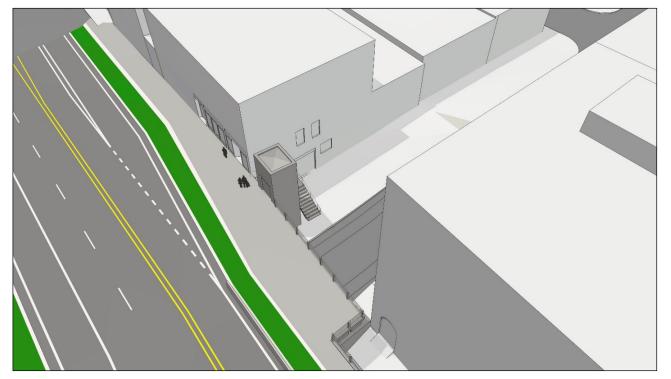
Proposed new pedestrian access at north side of west approach, artist's rendering, aerial view looking northwest (Fat Pencil Studio, 2021).
